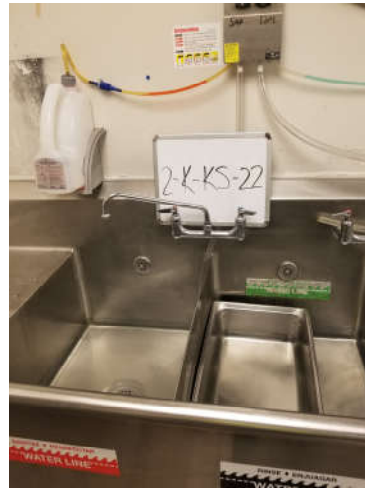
Kitchen sink, located on the 2<sup>nd</sup> floor in the kitchen. From left to right.
